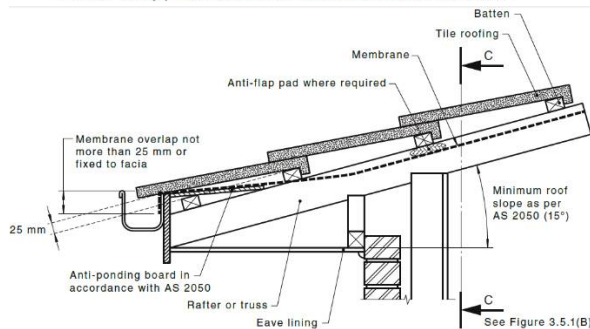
(D) LOW PITCHED TILED ROOF (WITH ANTI-PONDING BOARD)—MEMBRANE INSTALLED UNDER BATTENS
